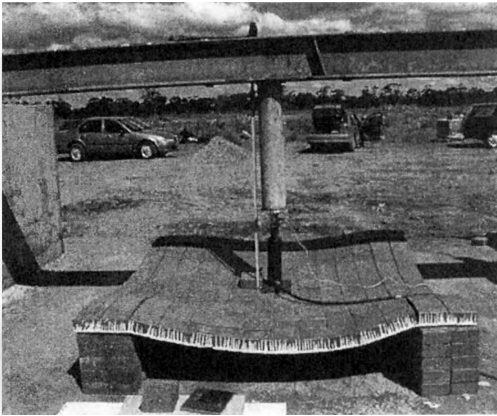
Flexure tests with Mineguard on the large slab just before failure.
